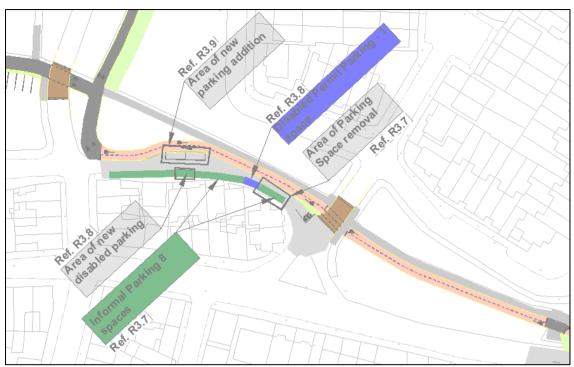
Proposed scheme design and parking changes along Strand Road
